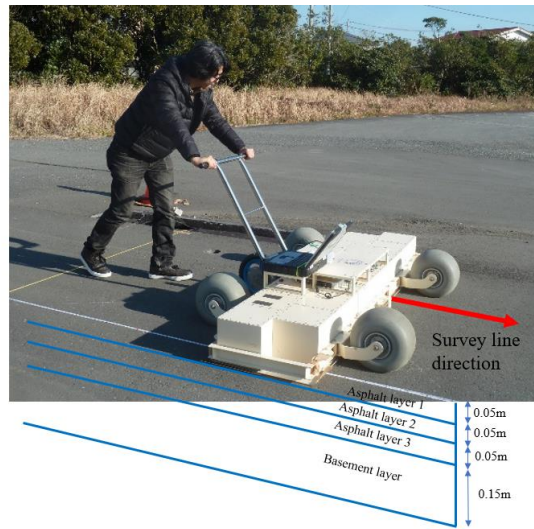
Road pavement inspection using Yakumo.
